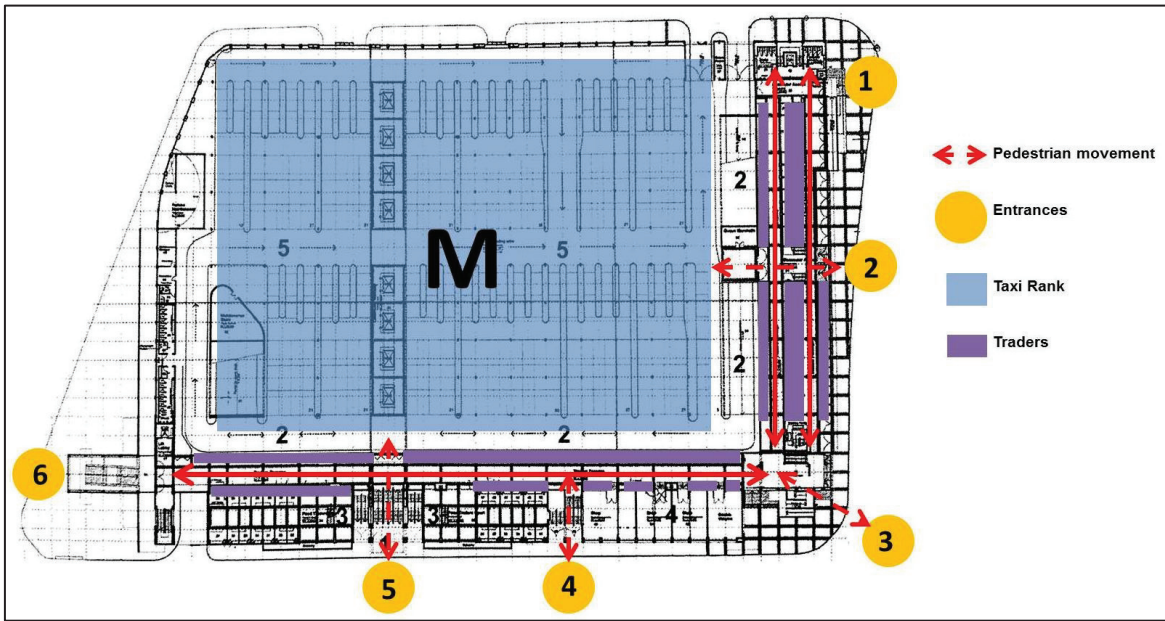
Plan of the building showing the configuration of spaces
